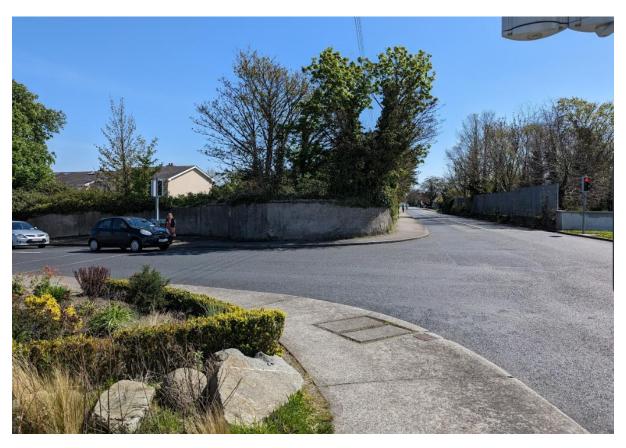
Existing Conditions at Rochestown Avenue / Sallynoggin Road junction
